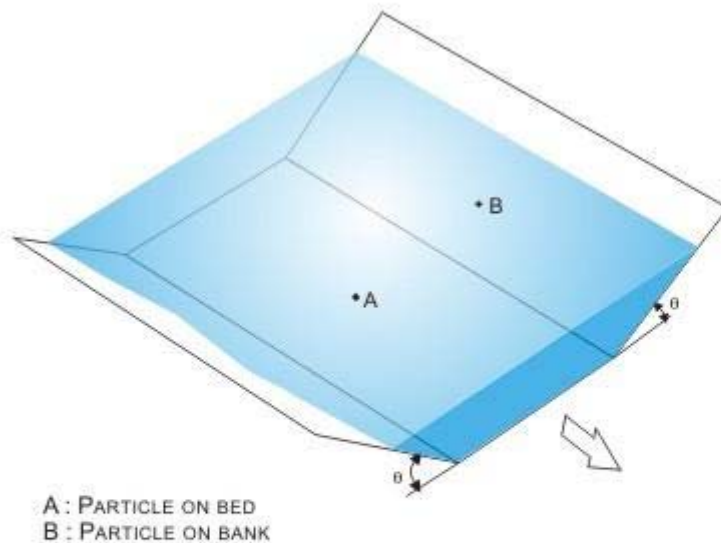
Trapezoidal shaped unlined alluvial canal
